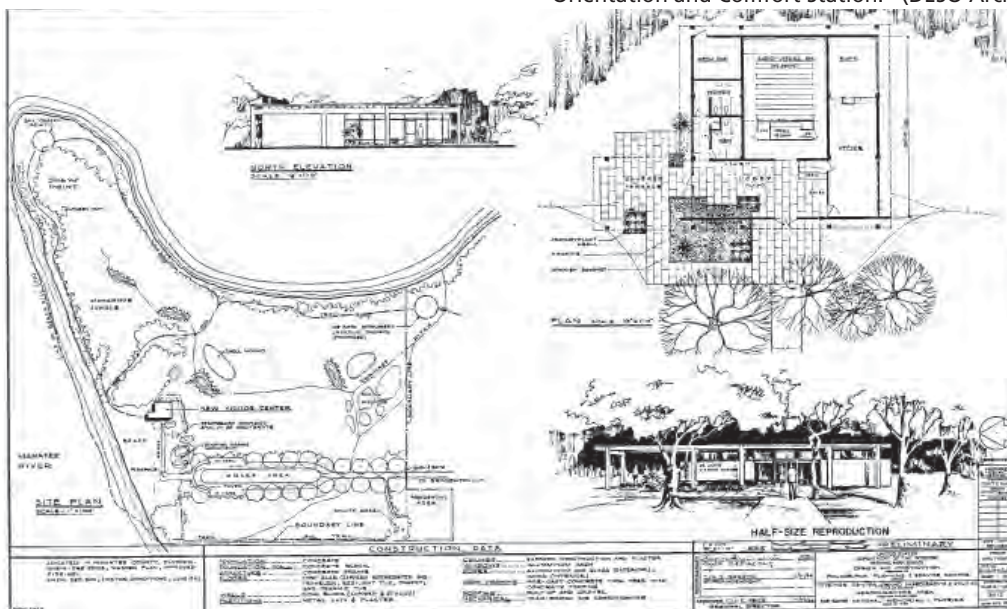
Preliminary visitor center drawing - site plan, building/planting plan, elevation and perspective sketch, November 1966; Drawing No. NMEM-DES-3012. (SERO Archives. See also Appendix C)
